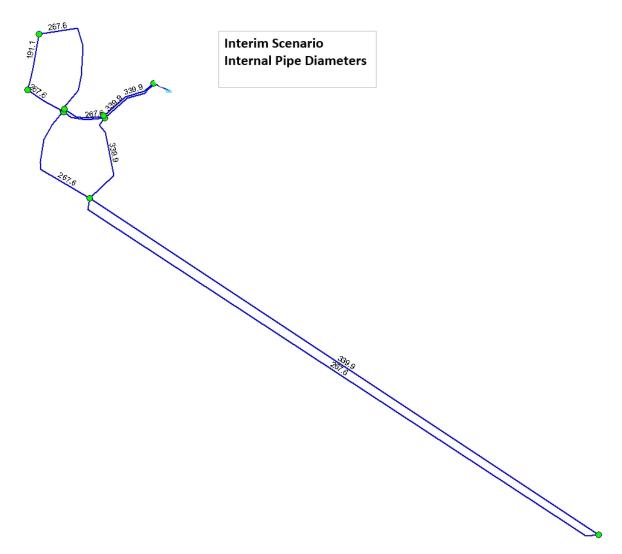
Auranga A & B and Drury South Supply Pipe(s) – Sizes (Interim Layout)
